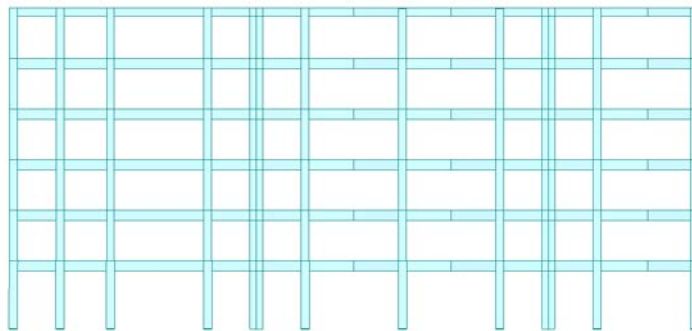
Elevation layout of the equivalent shear wall-pier
